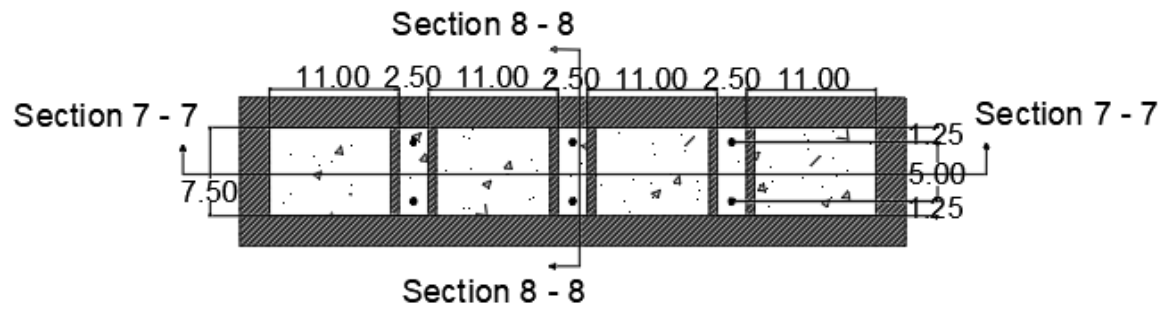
Specimen Plans View for Group Anchors Sets, all dimensions in inch.
